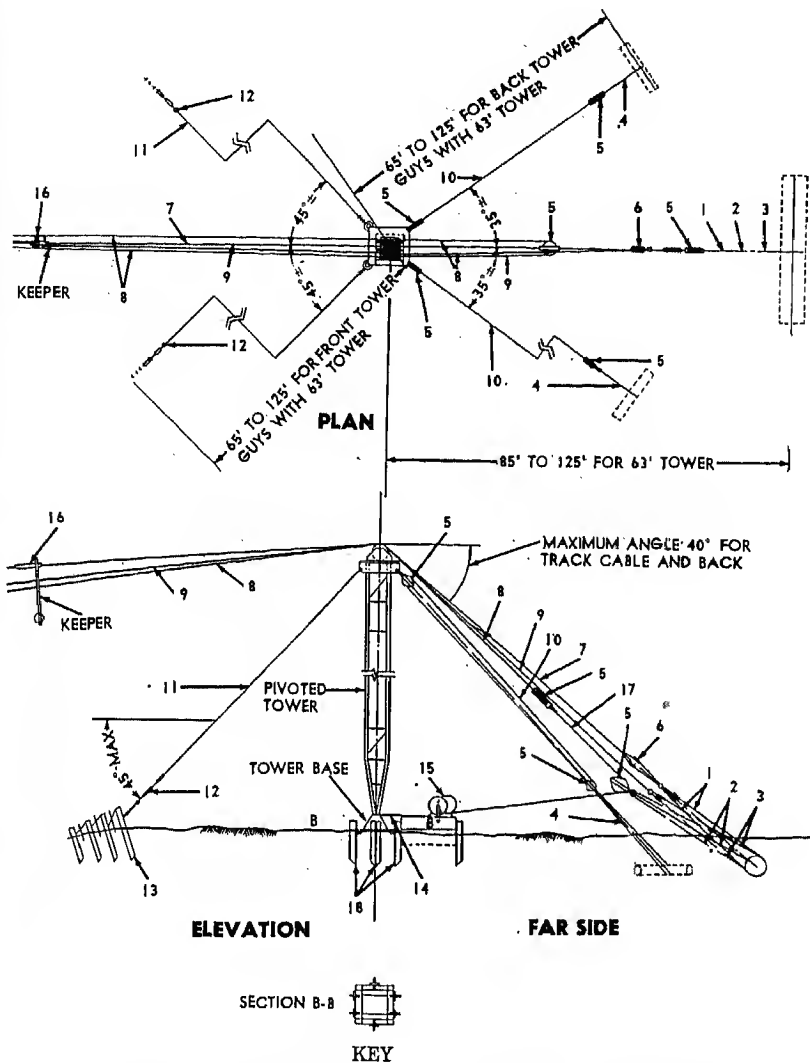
Layout of cableway, guylines, anchorages, and power unit.
